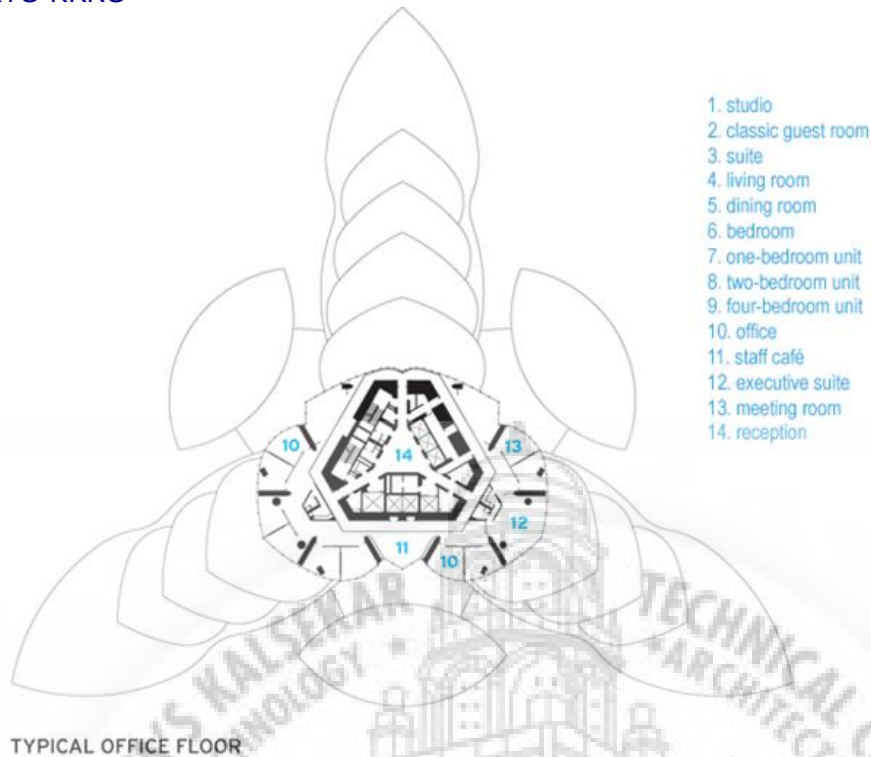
Plan (3) Burj Khalifa (Source – archichoong)
